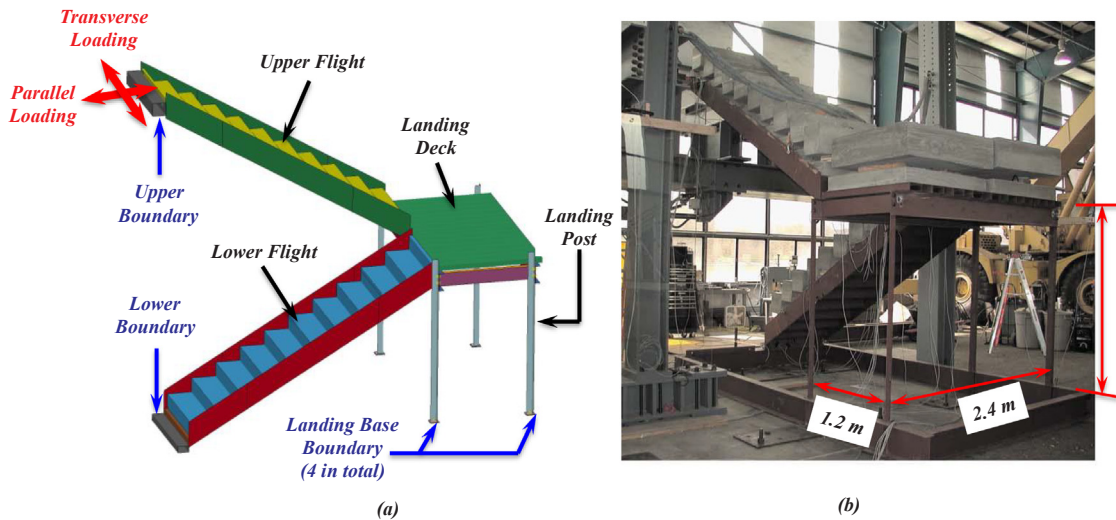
Prototype prefabricated steel stair (modeled after tests in [10]): (a) three-dimensional finite element model, and (b) test specimen and setup.
